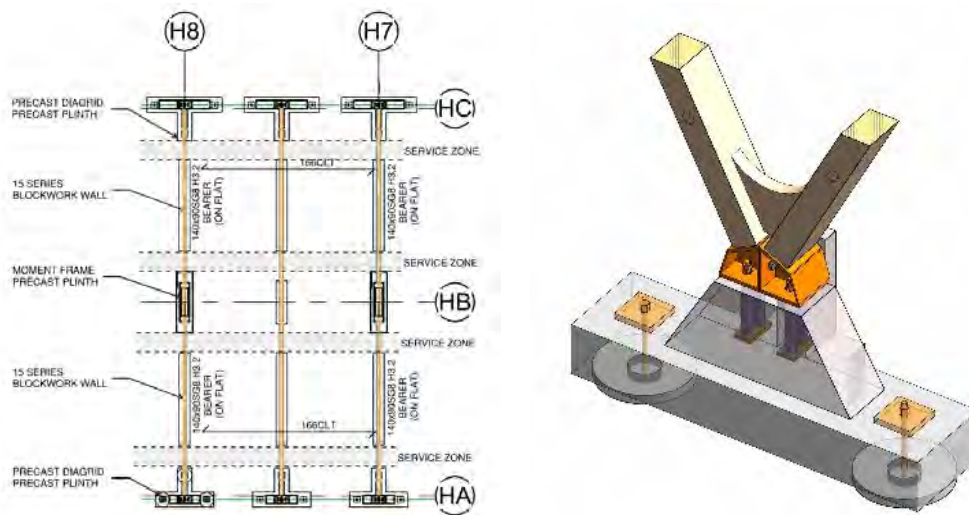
(Left) Typical Foundation bay, (Right) Diagrid Plinth
